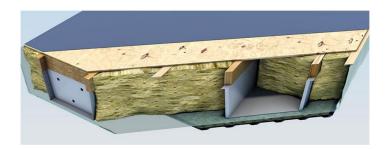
The roofing system, (LETT-TAK SYSTEMER AS 2016)
